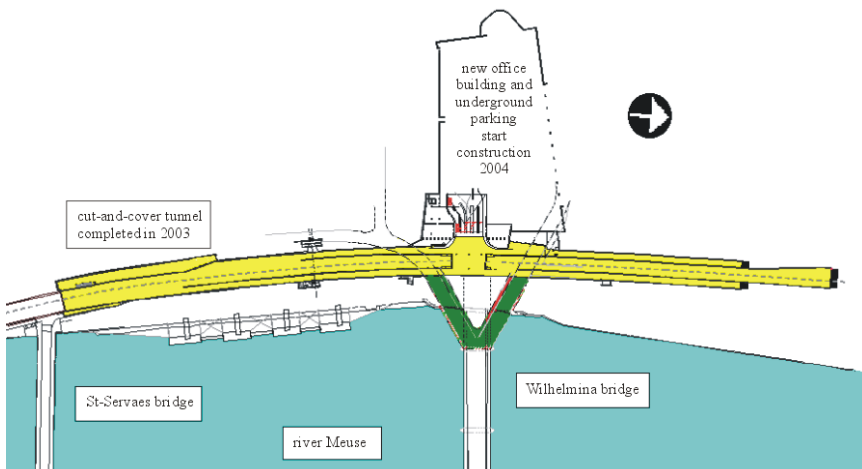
Cut-and-cover tunnel, new office building/underground parking, and reconstruction of the western abutment of the Wilhelmina Bridge.
